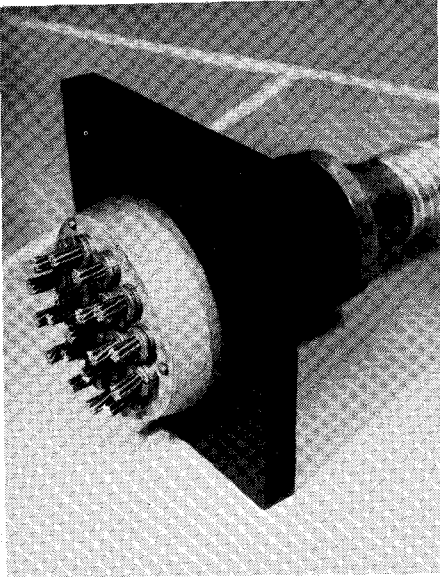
Bearing plate anchorage for multiple strand tendon for conventional box girder bridges cast in place on falsework.
